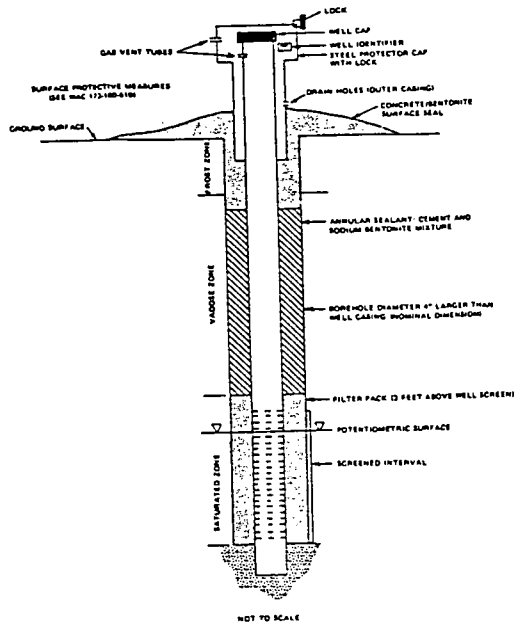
GENERAL RESOURCE PROTECTION WELL—CROSS SECTION
